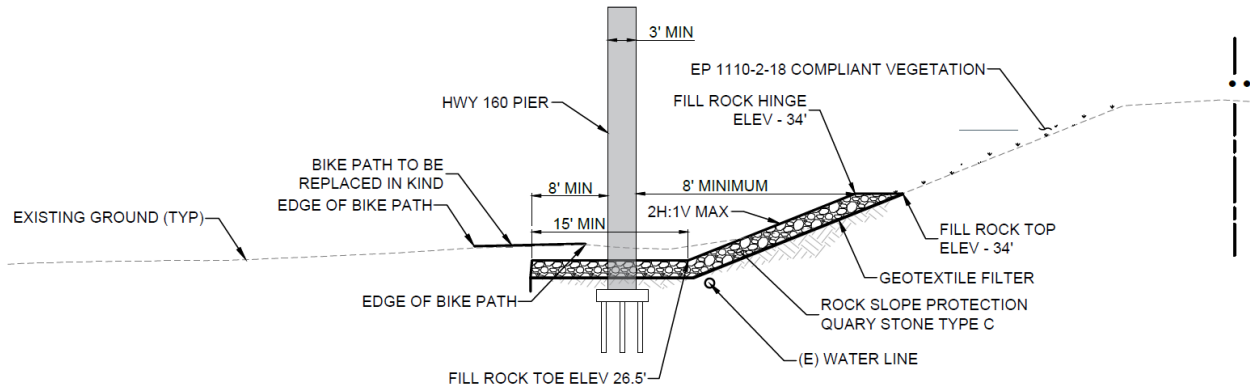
Stone protection design cross-section immediately downstream of LAR 2.16R
